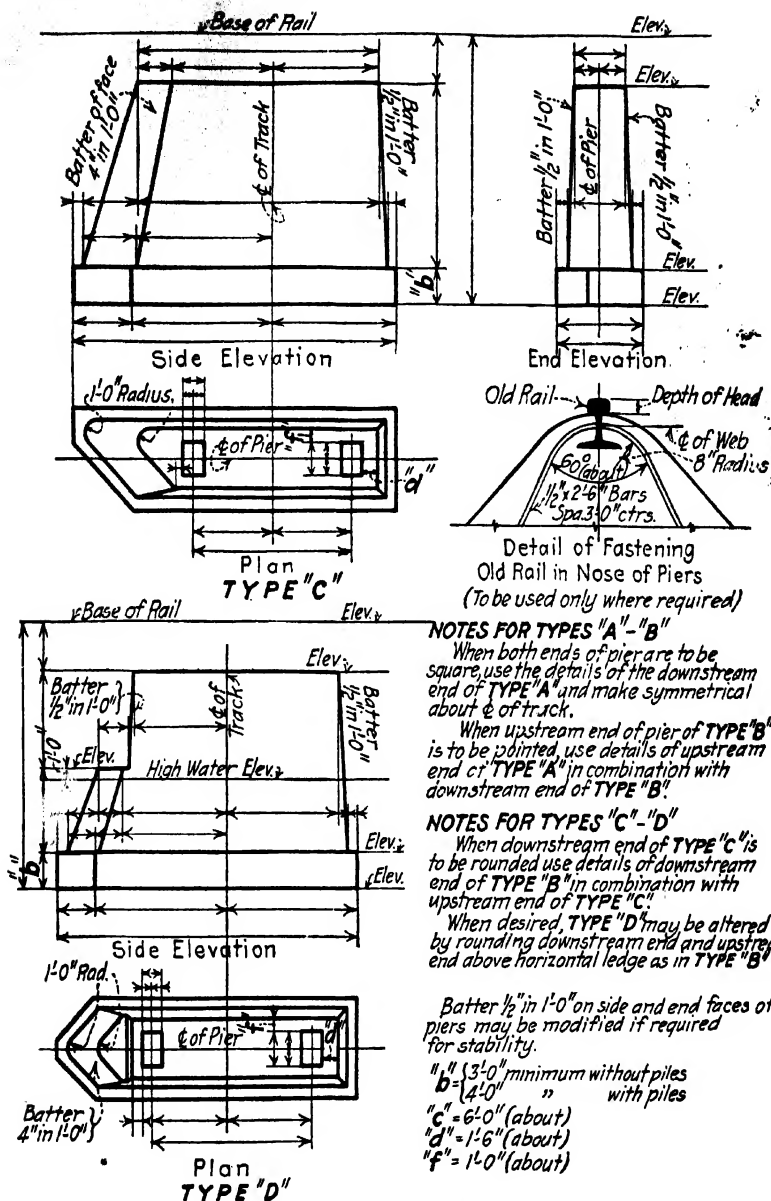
(a).—Standard mass bridge piers of C. M. & St. P. Ry.
